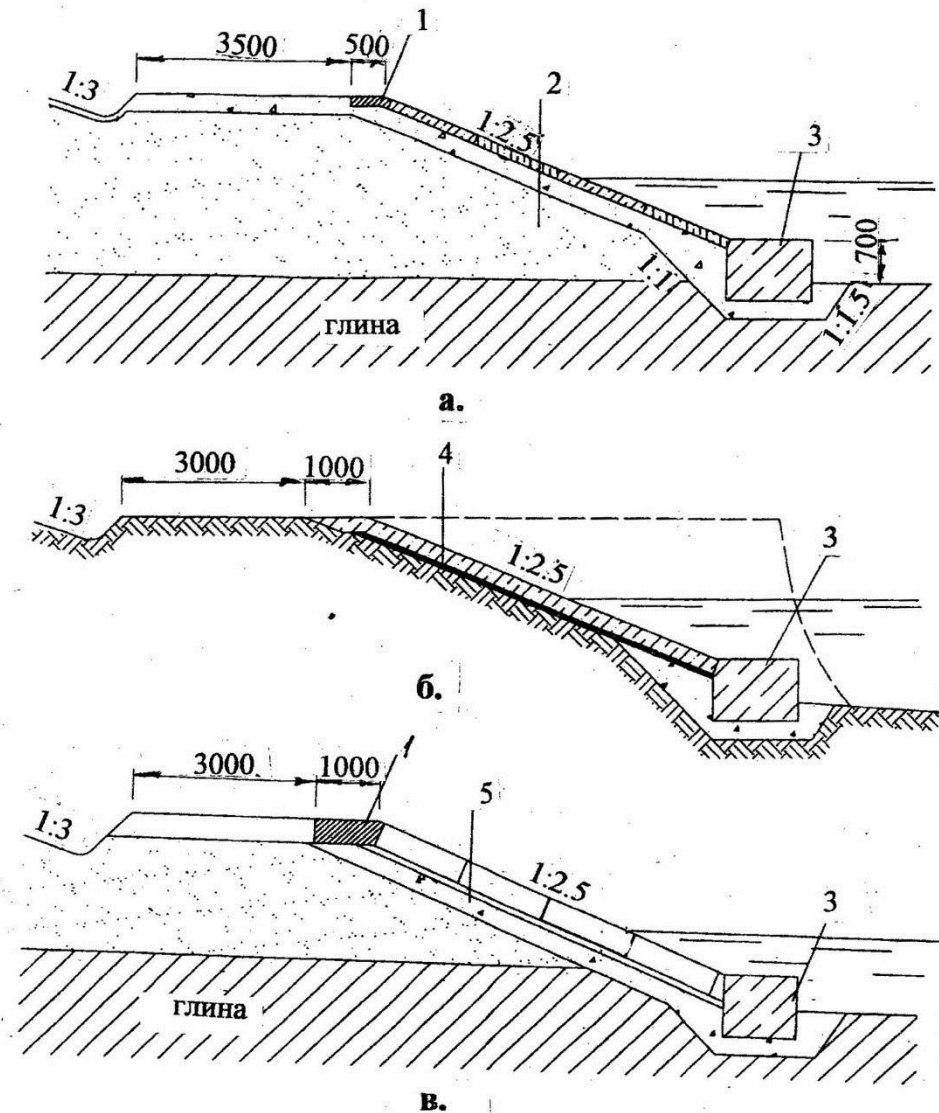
Fastening of slopes: a) with precast reinforced concrete; b) monolithic concrete; c) iron boxes: 1- monolithic reinforced concrete; 2- reinforced concrete slab PP-1.5, $t = 160$ mm on preparation from gravel-sand mixture $t = 300$ mm; 3- thrust block; 4 - monolithic concrete on two layers of preparation of gravel and sand, $t = 150 - 200$ mm each; 5 - metal boxes filled with stone in the preparation of crushed stone $t = 100$ mm from gravel-sand mixture, $t = 300$ mm. at 45° angle to the horizontal.
